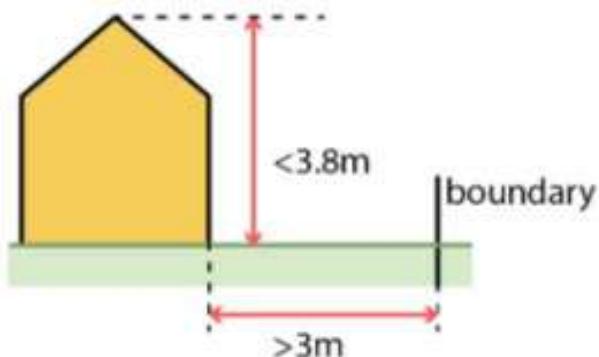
Proposed maximum height of a dual pitched garden building or pergola
